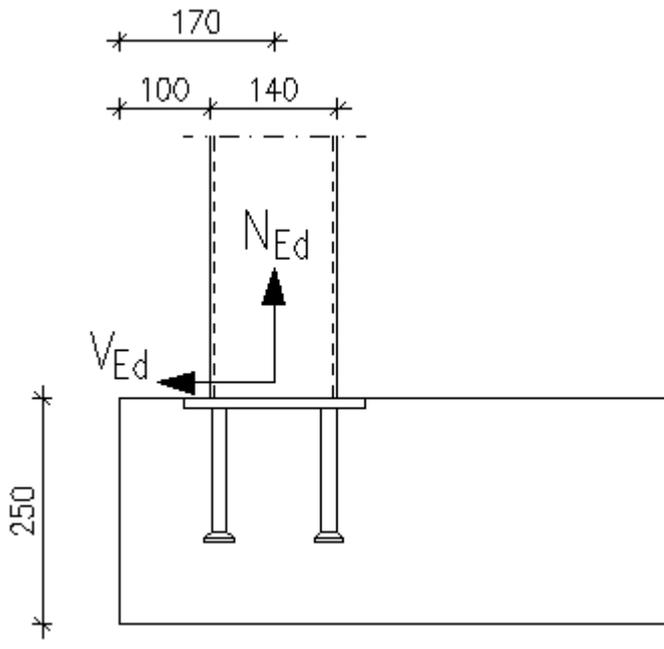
Design example for SBKL fastening plate with additional reinforcement. Fastening plate dimensions.
